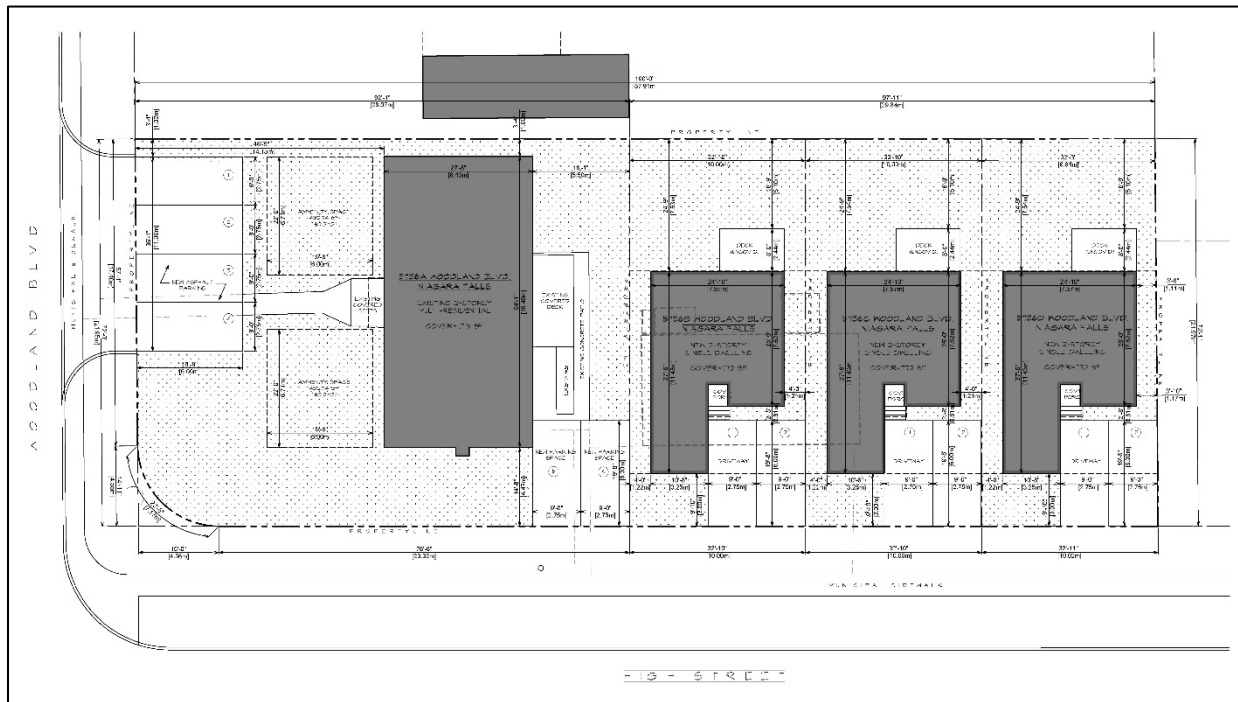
Proposed Consent Sketch/Lot Configuration (Core Design Drafting)
